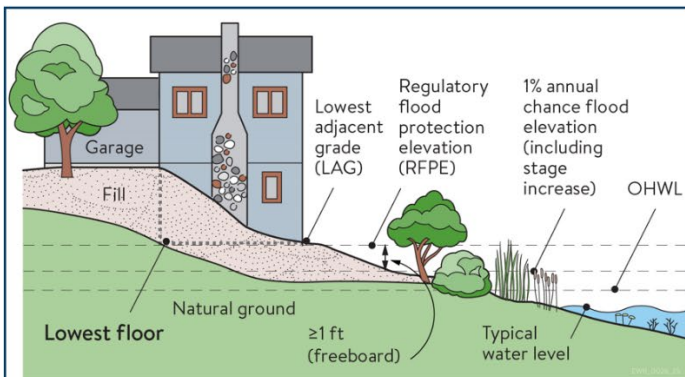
Top of walkout basement is lowest floor. A walkout basement is permitted for a home in the flood fringe if the walkout side is at or above ground level and the top of the lowest floor is above the RFPE.
